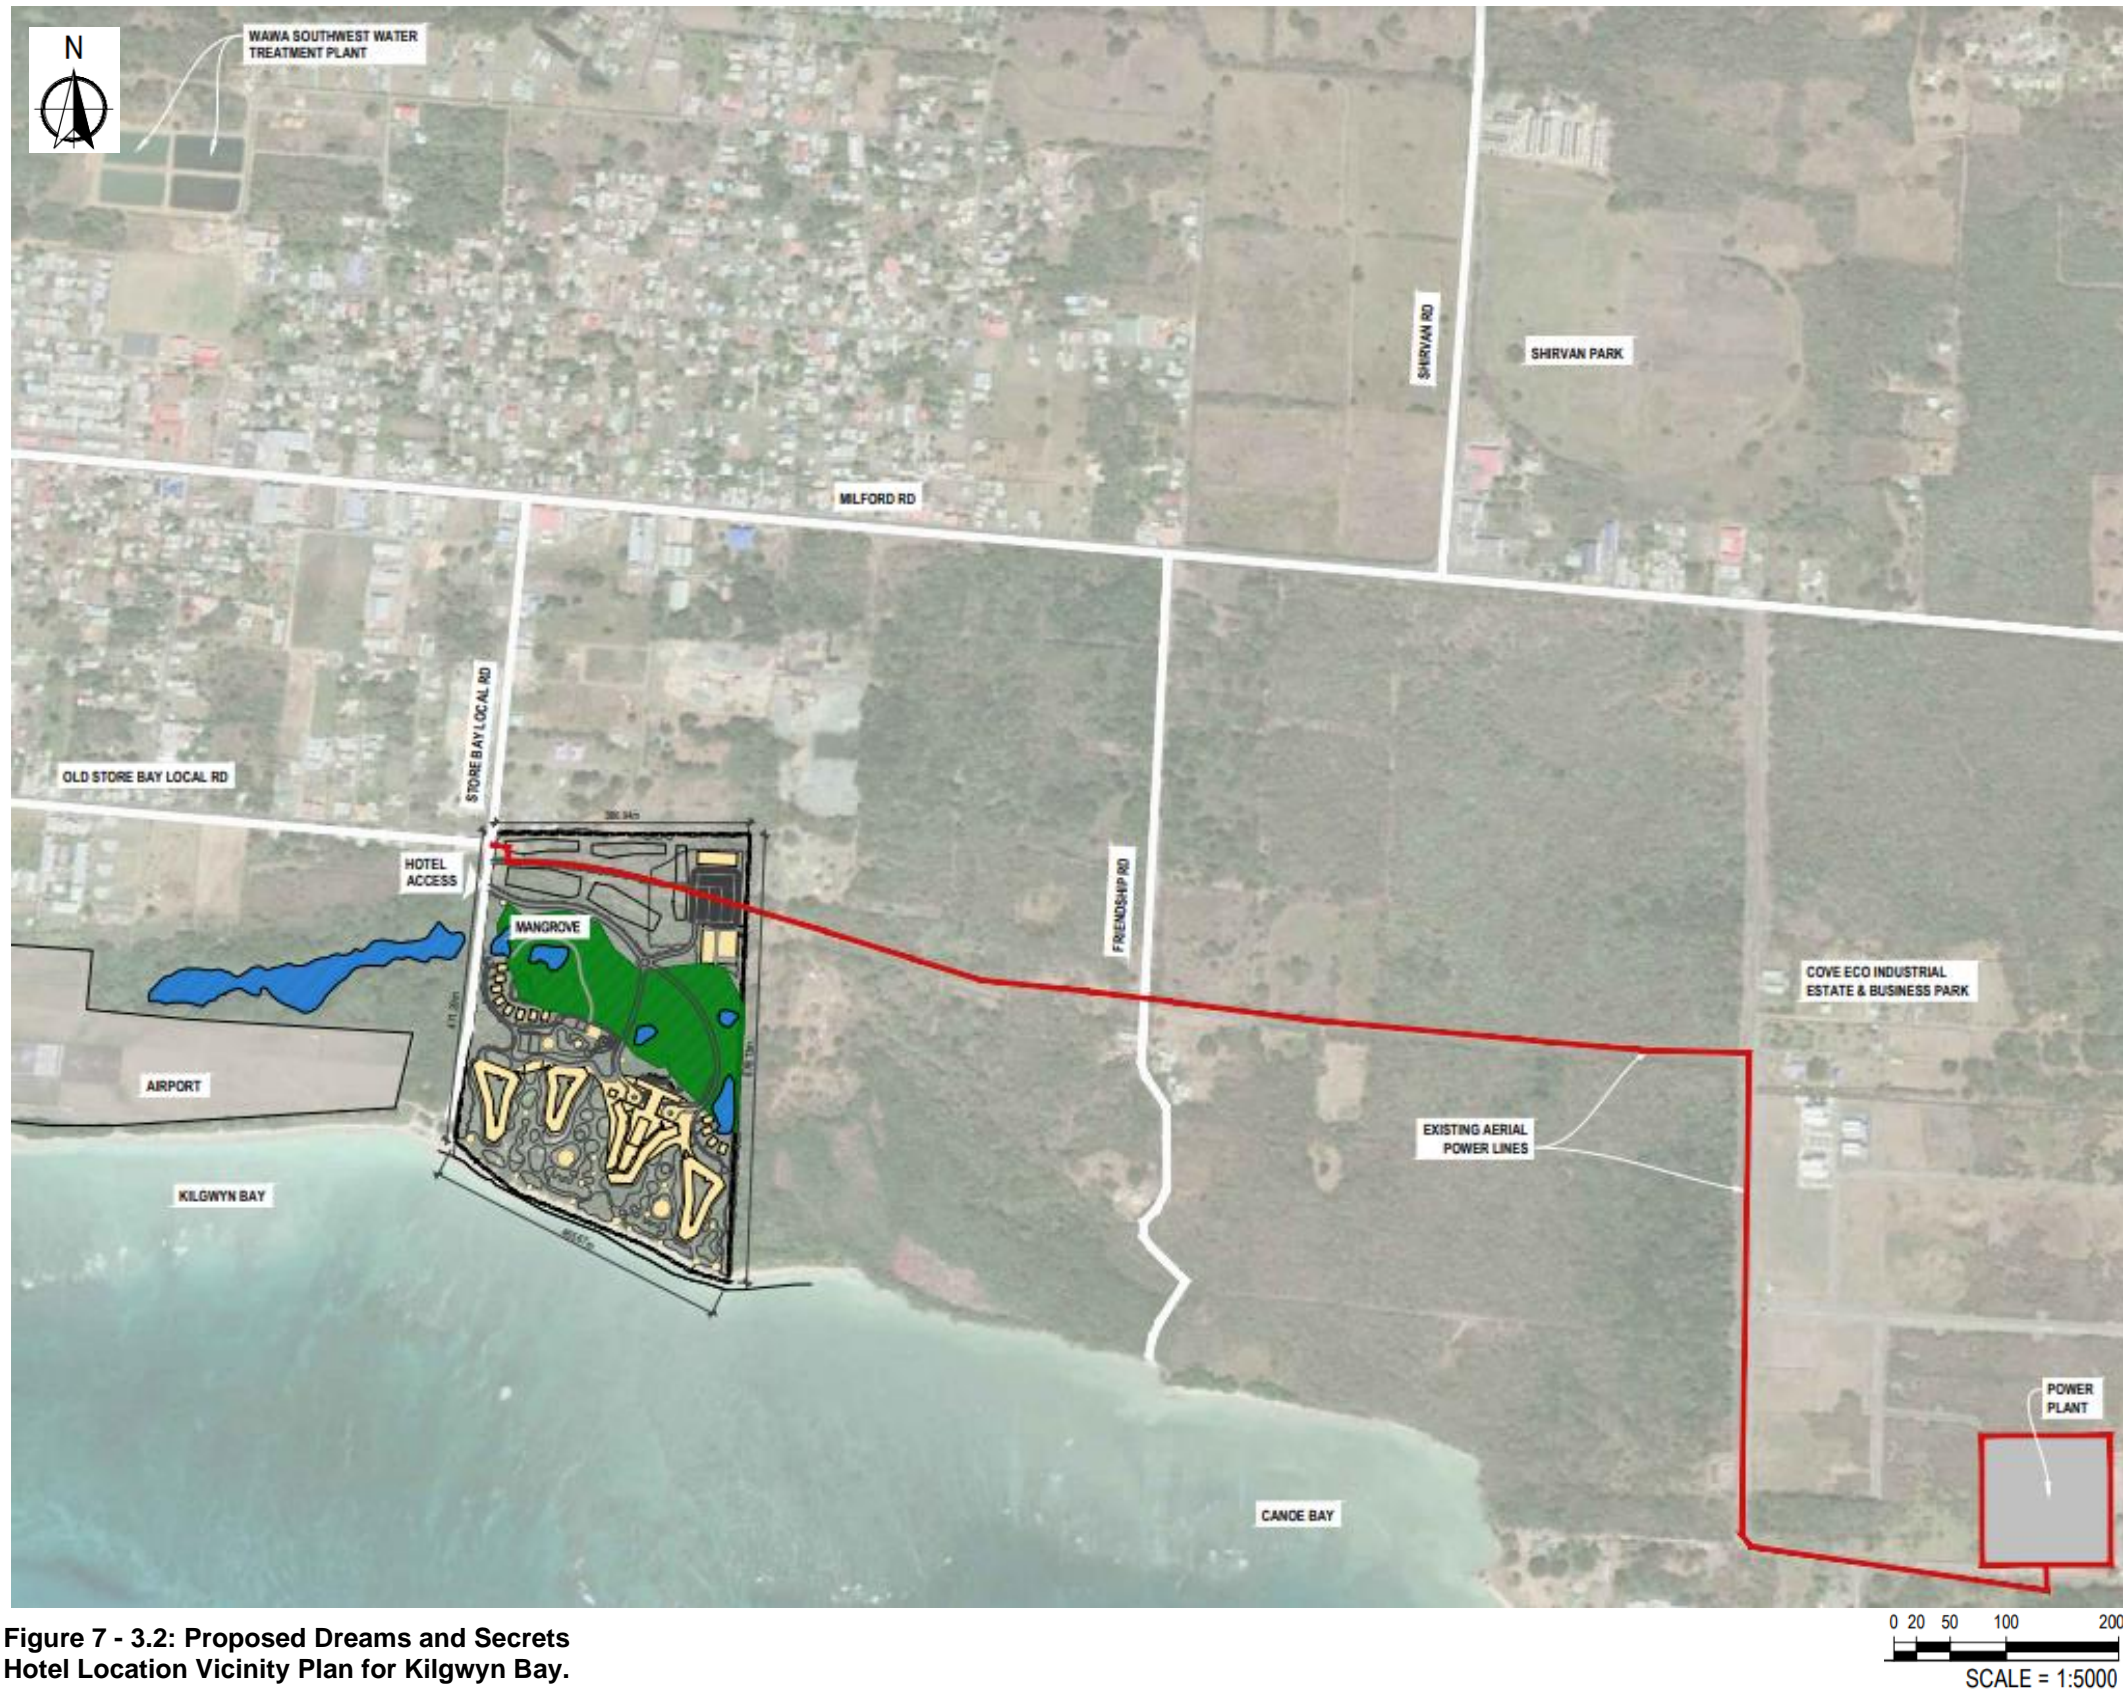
3.2: Proposed Dreams and Secrets Hotel Location Vicinity Plan for Kilgwyn Bay.
